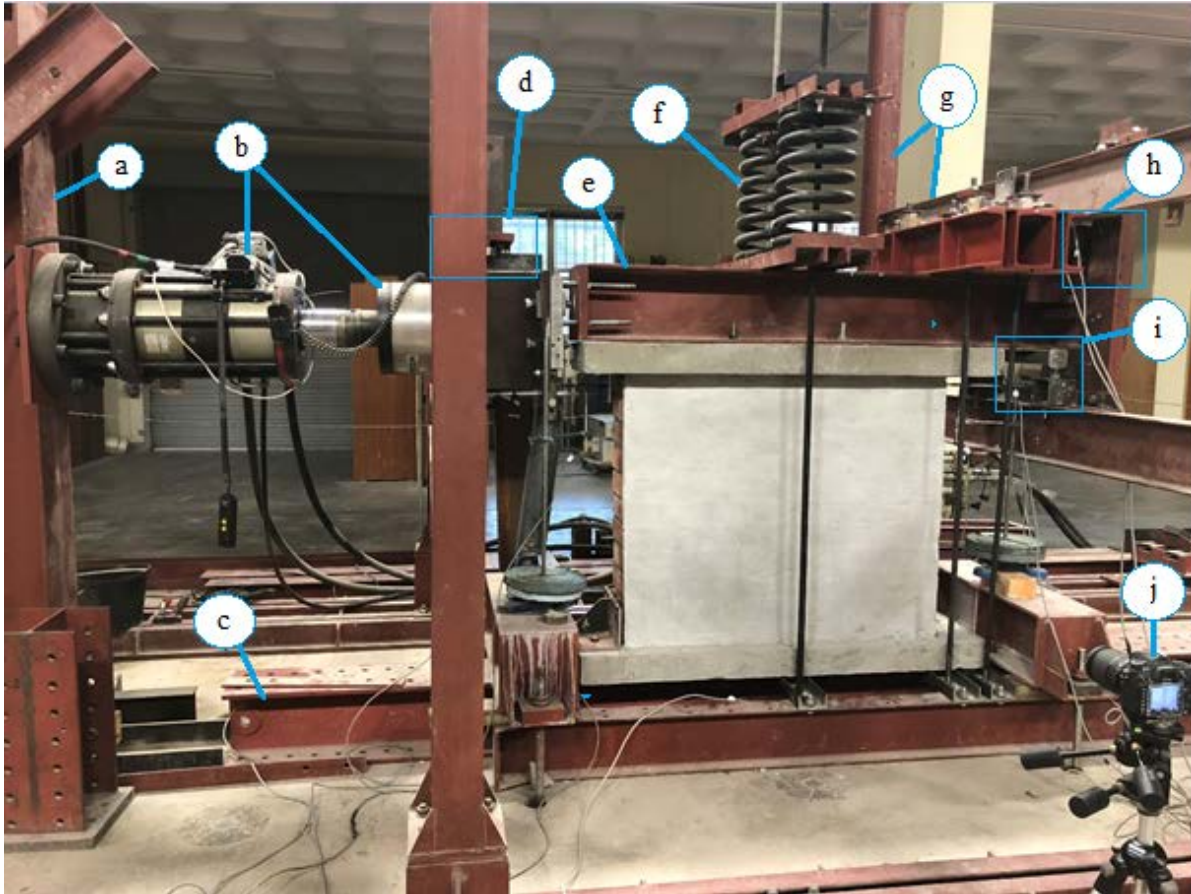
Testing machine setup with a SW specimen in place; (a) Instron supporting frame; (b) Instron actuator; (c) Base steel beam; (d) Instron head lateral roller support; (e) Load spreader beam; (f) Coil springs; (g) Lateral roller supporting frame structure; (h) Spreader beam connected to a lateral support; (i) Vertical roller support; (j) Camera.
